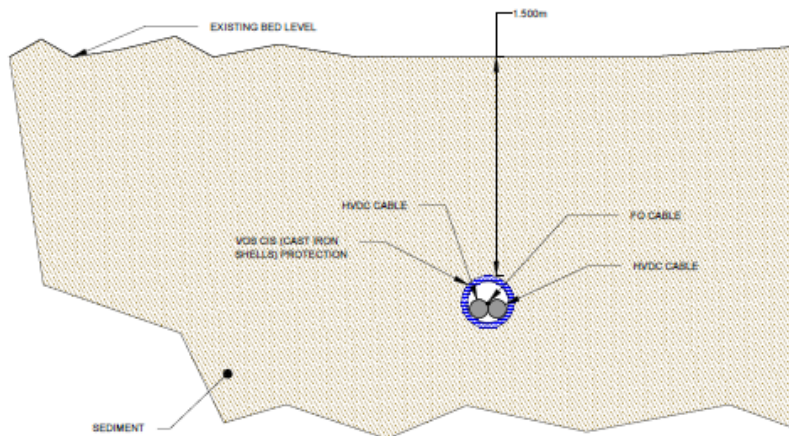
Cross-section with cables in Cast-Iron Shells
